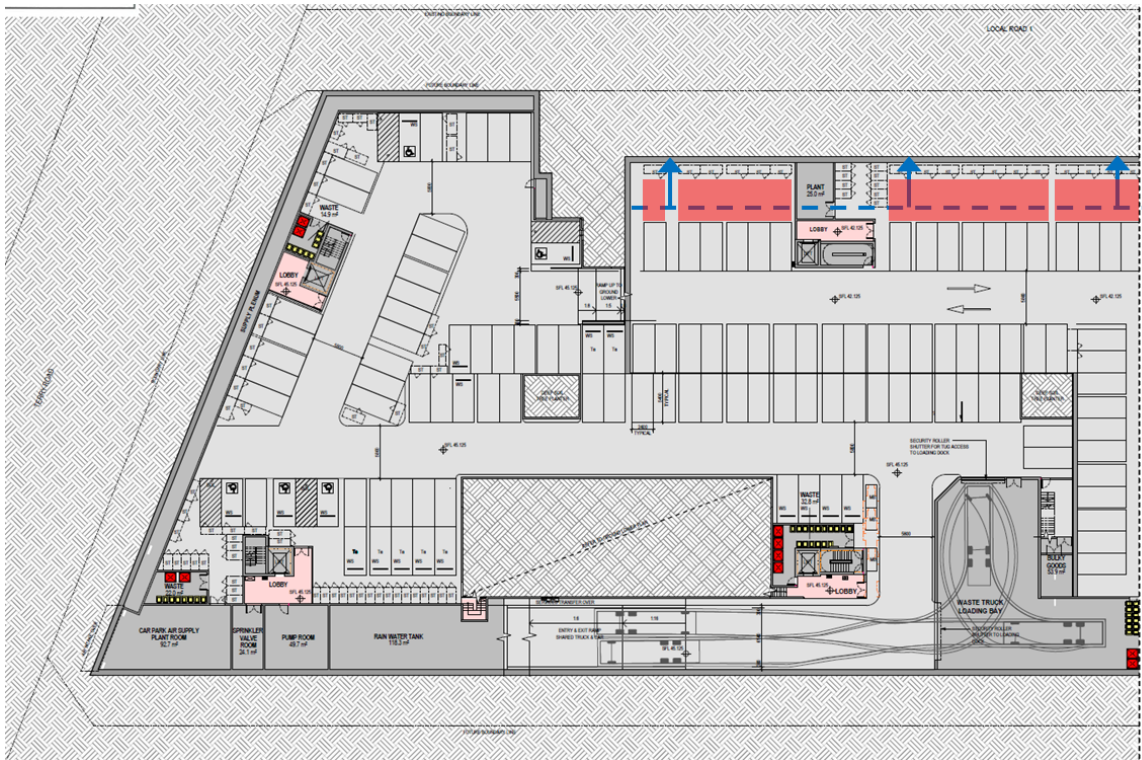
Extract from the Building A, B and E Basement Plan TP11.00 showing the extension of the basement to the north (shown in blue) and resulting resident storage areas (shown in red).
